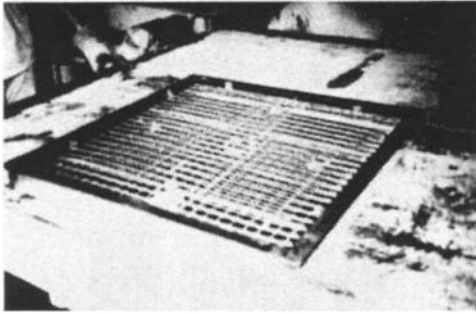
Reinforcement details of ferrocement secondary roofing slabs
